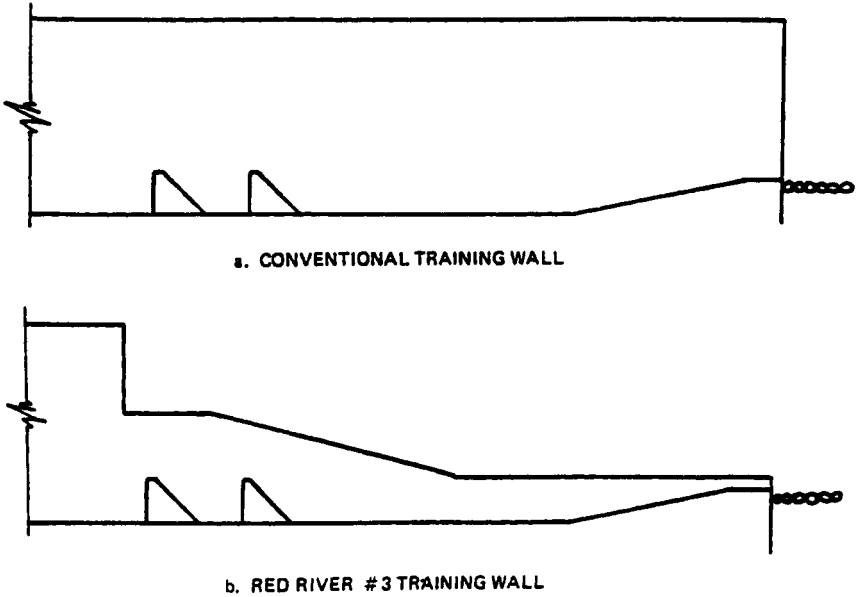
Training Walls: (a) Conventional Training Wall; (b) Red River #3 Training Wall.
